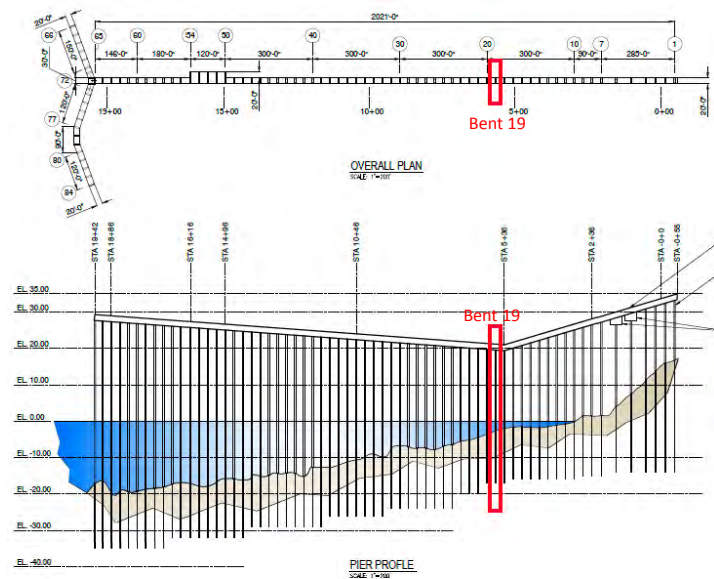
Plan and Elevation of Ocean Beach Pier Bent 19.
